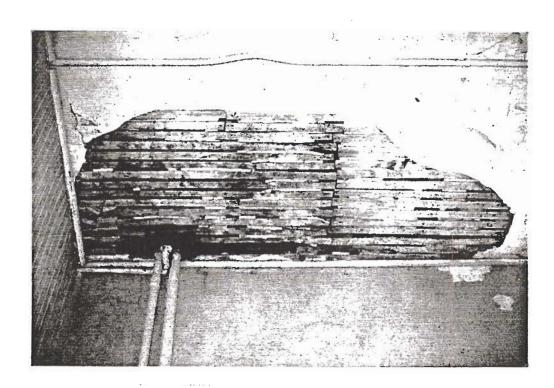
First Floor: Water Damage to Ceiling.
